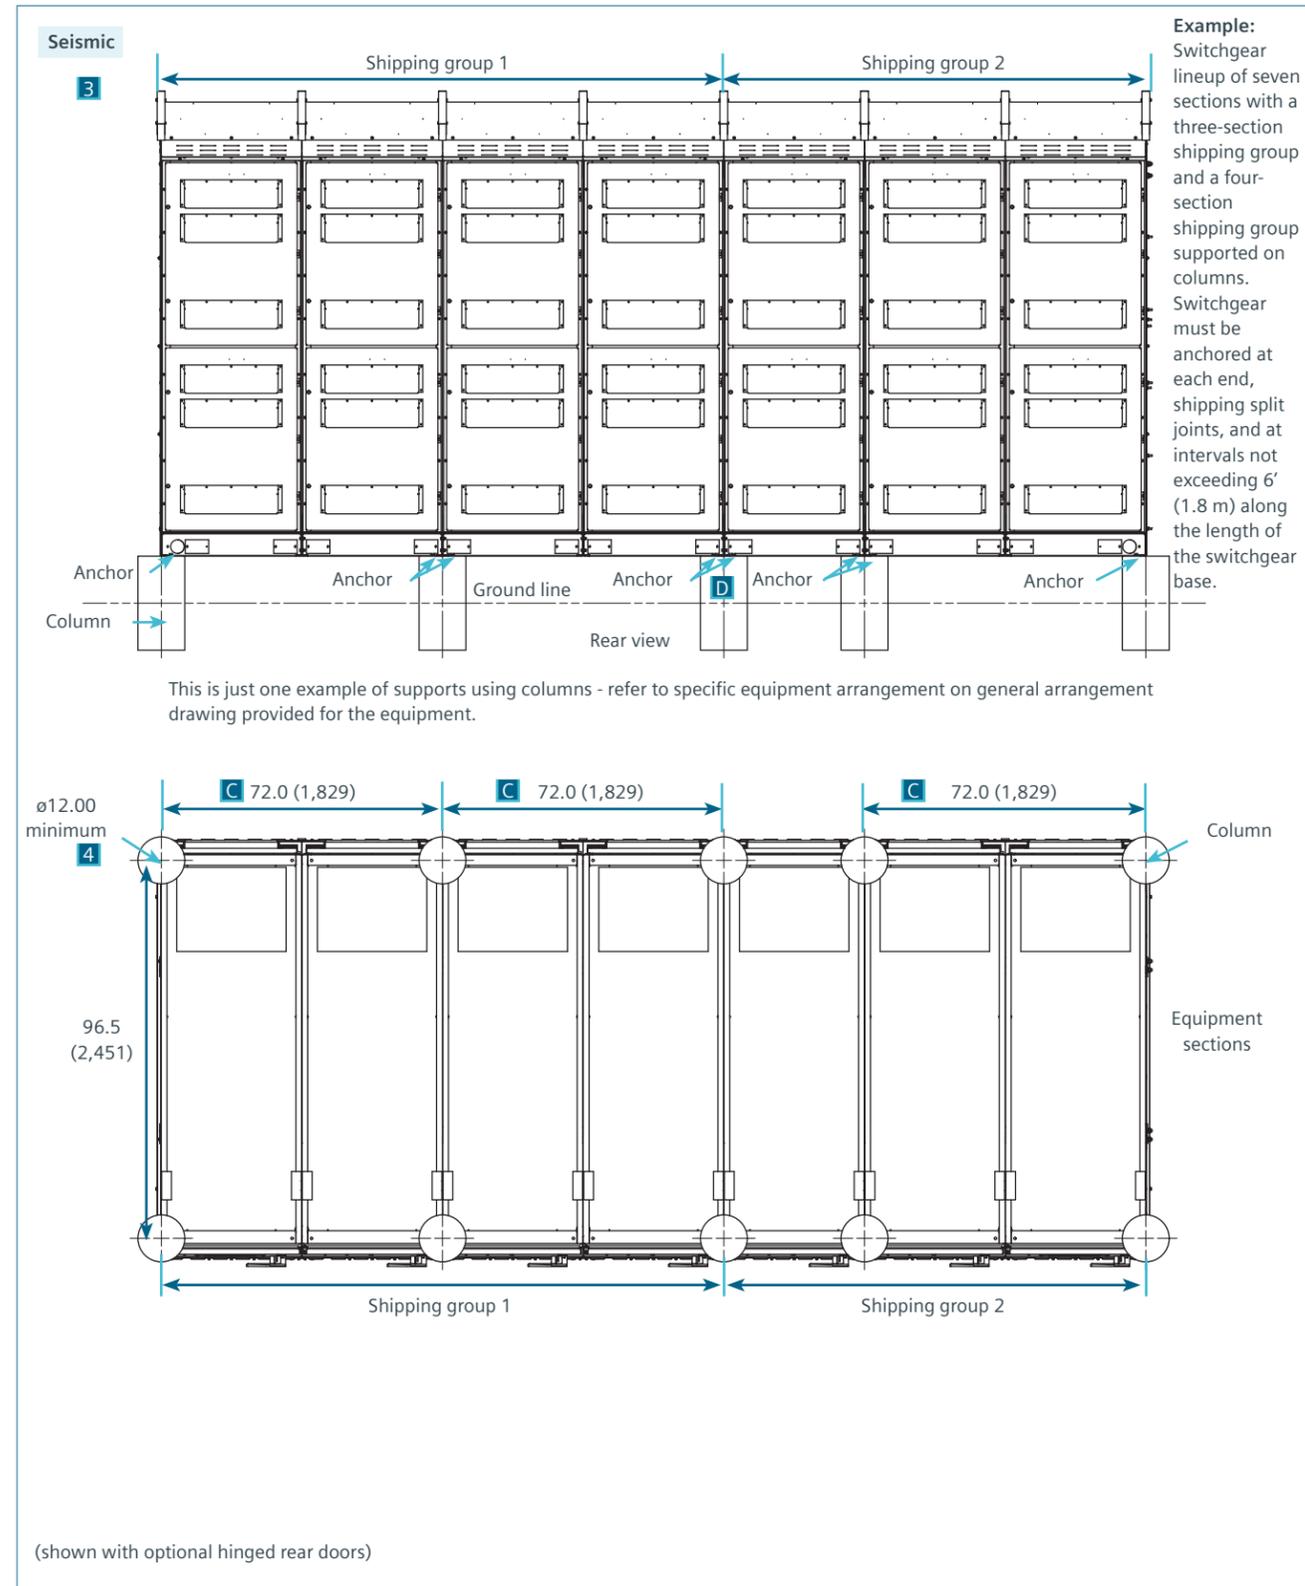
Anchoring outdoor type OGM-SG non-walk-in switchgear (continued)
